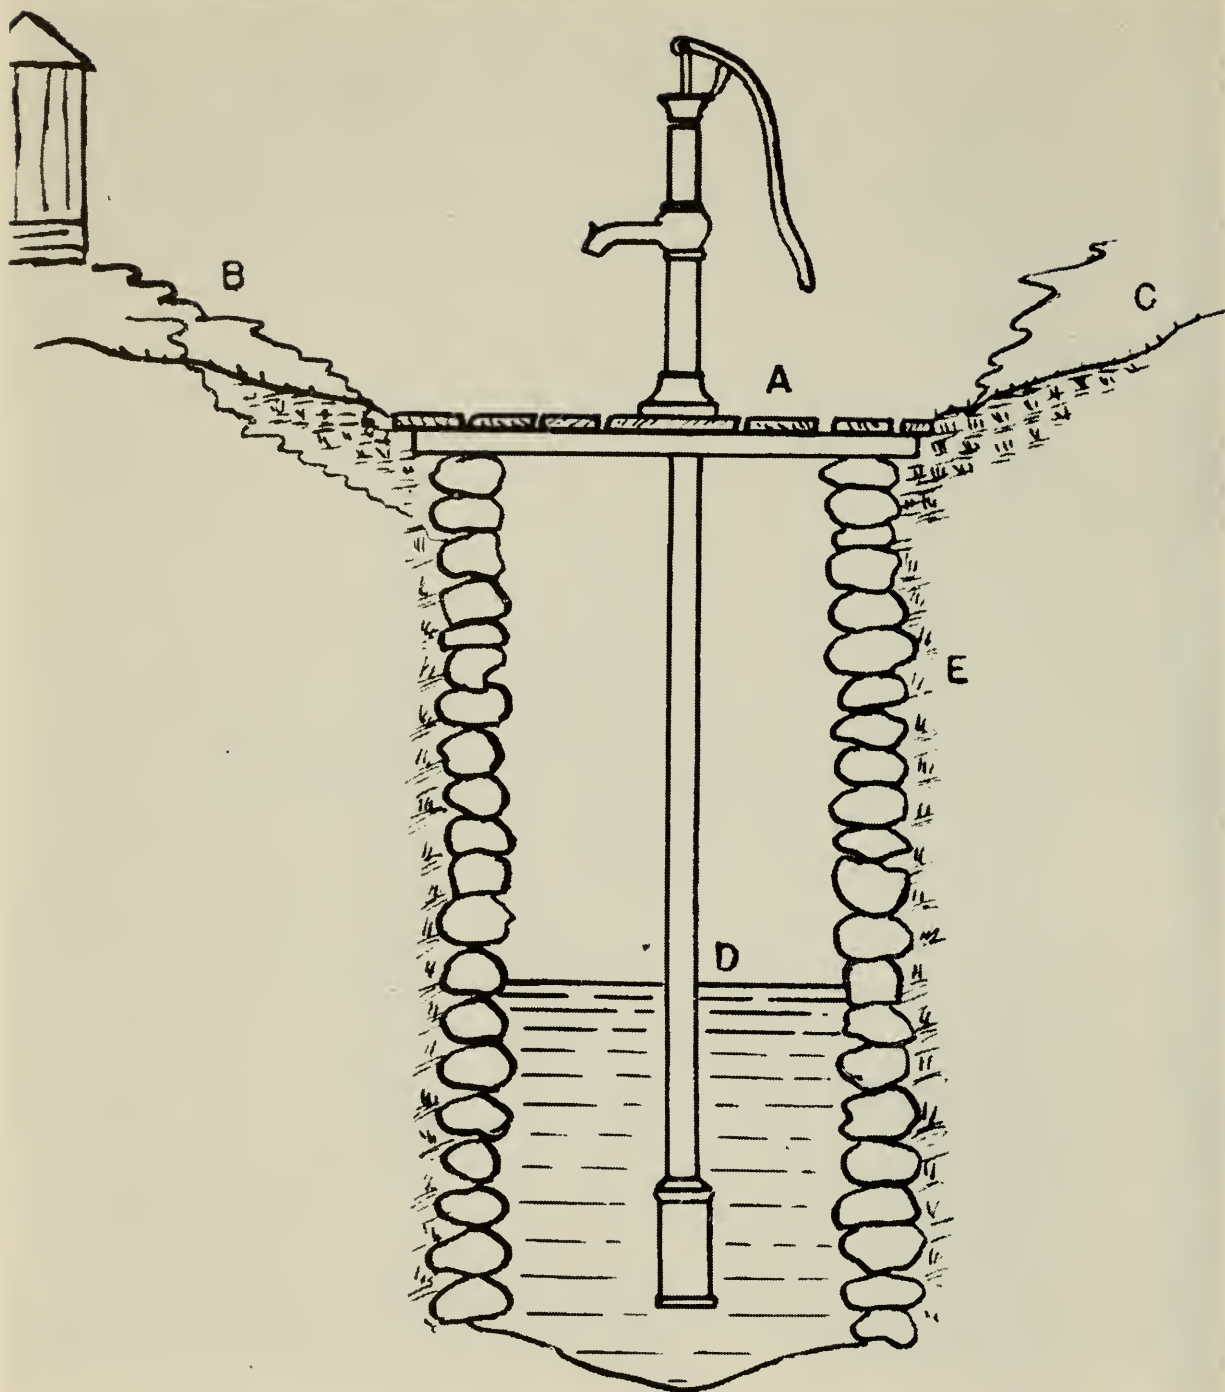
Improperly constructed and poorly located well. (A) Poor type of wooden top, (B) and (C) slope toward the well, allowing seepage from polluting sources, (D) water level, (E) loosely constructed stone wall, allowing seepage from surrounding soil to enter well. (E.H.G.)
